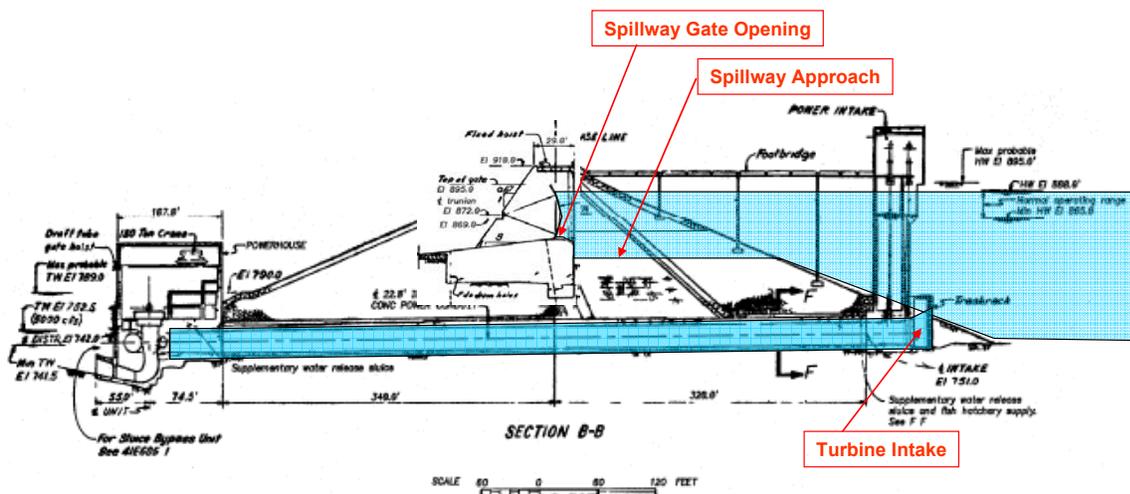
Section of Tims Ford Dam Showing Turbine Intake Pipe and Spillway Approach
